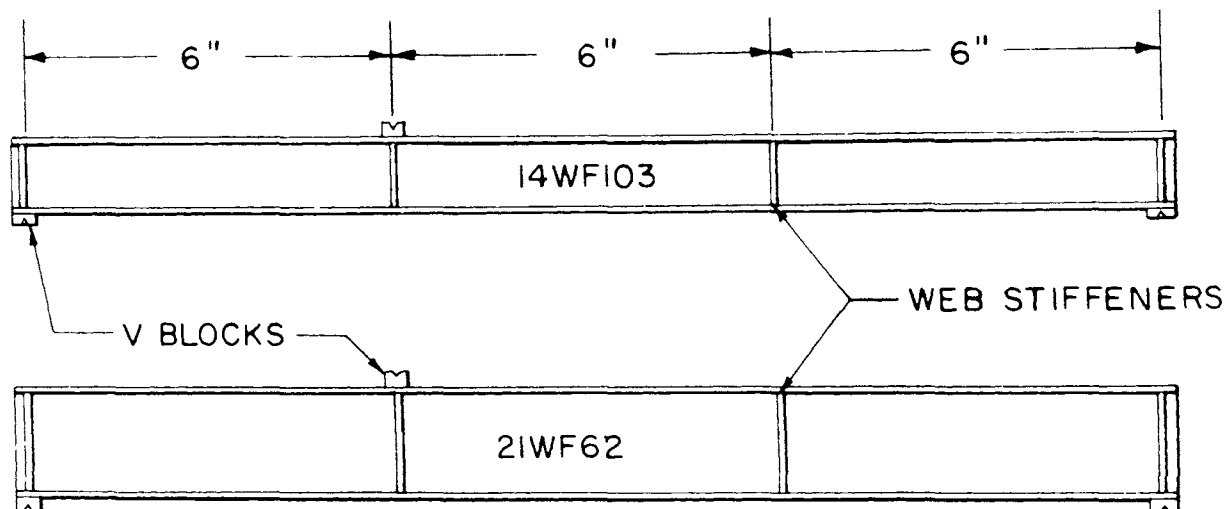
POSITION OF WEB STIFFENERS AND LOADING BLOCKS
